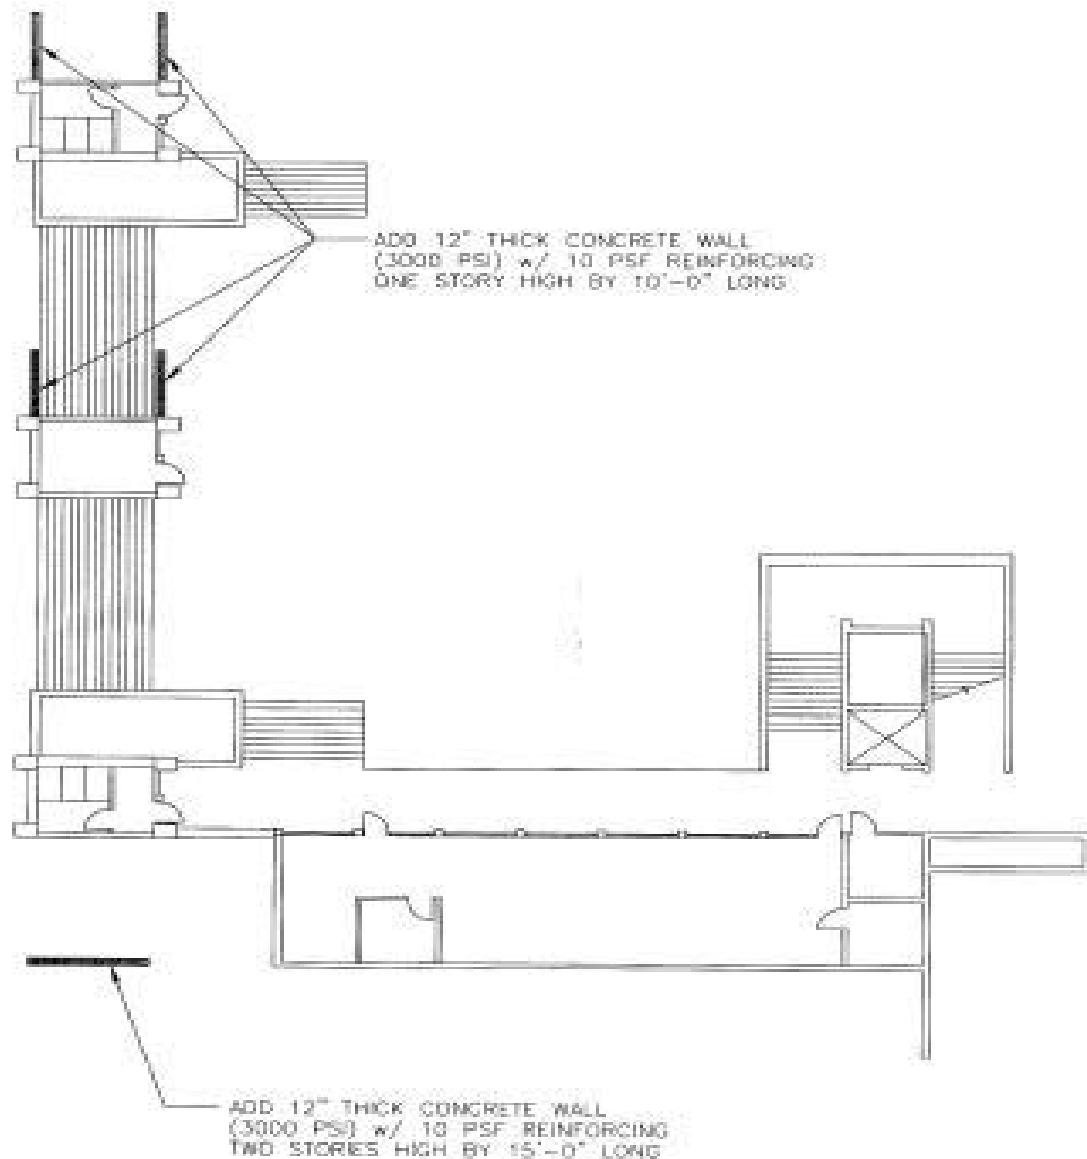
PROPOSED ADDITIONAL WALL LOCATION
